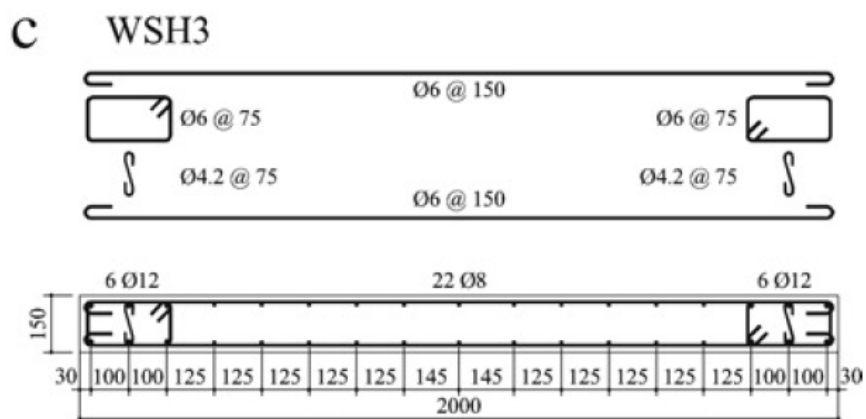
Transversal reinforcement details of WSH3 [DBB09].
